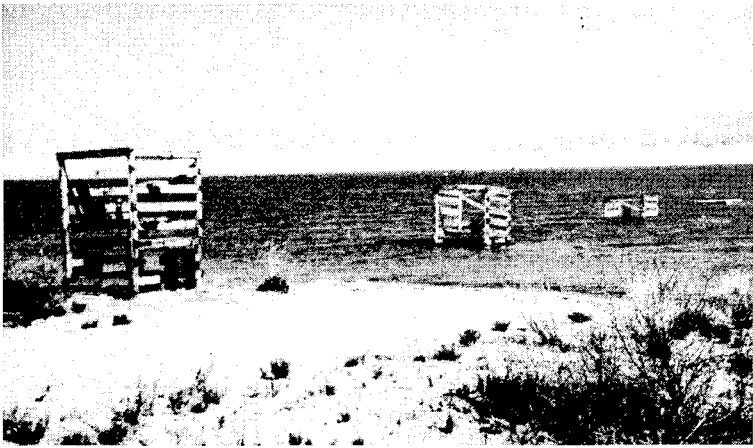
PHOTO A. SERIES OF SMALL STEEL DECANT TOWERS AT SAN MANUEL, ARIZONA.
